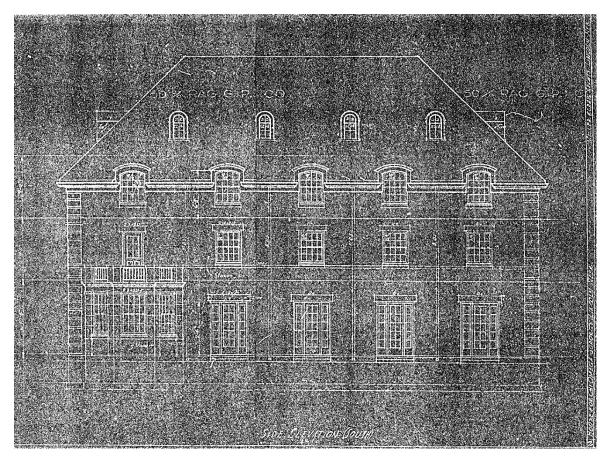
South Elevation as drawn by Miller and Craig in 1929 prior to the 1993 addition
